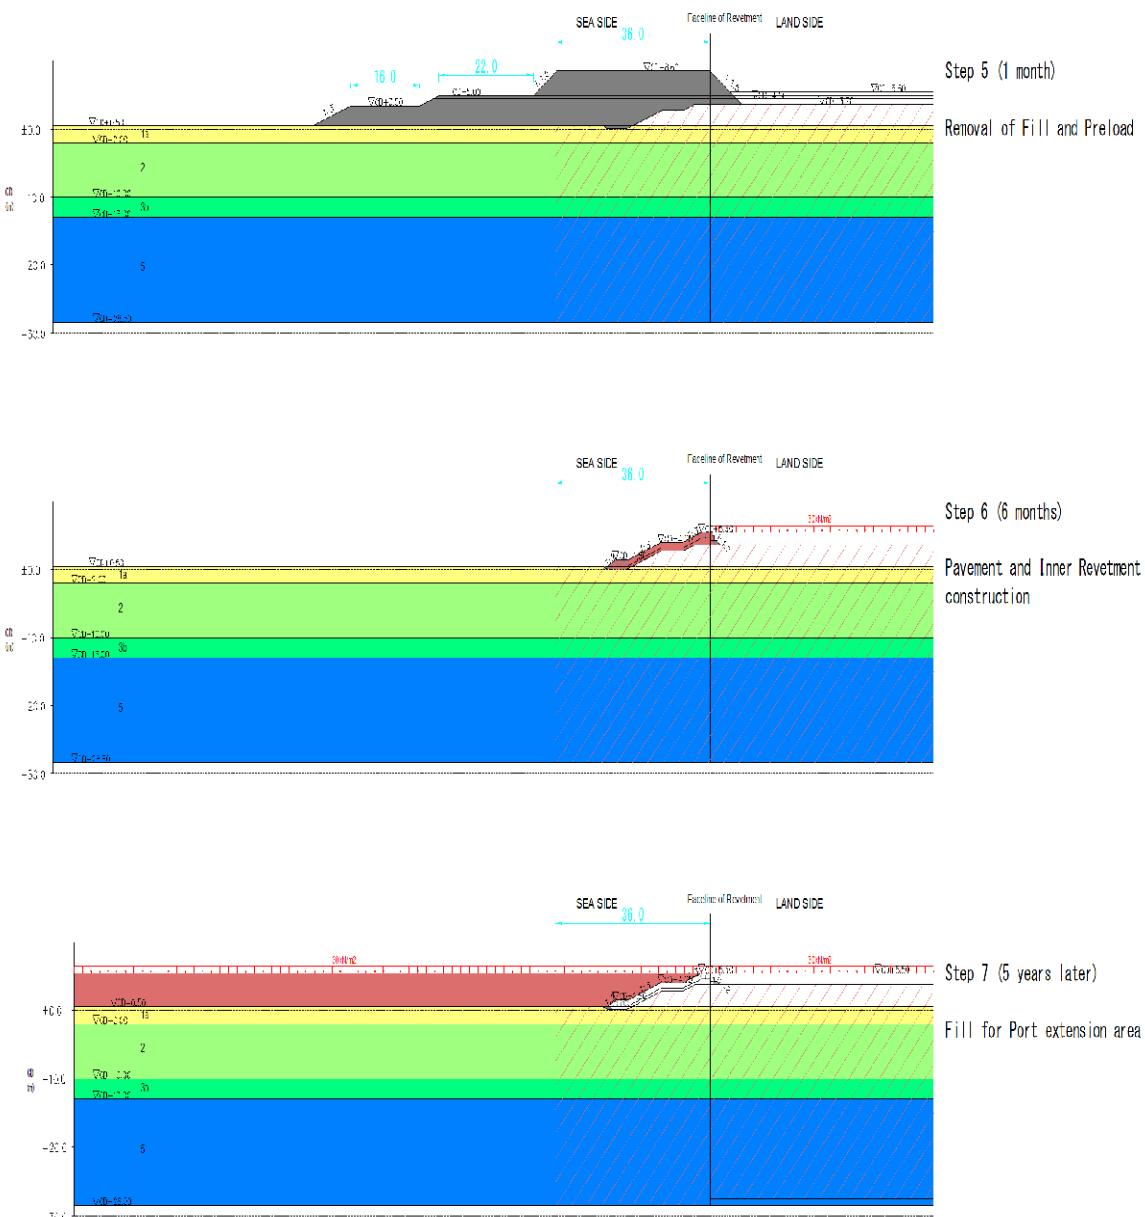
Subsoil Improvement Procedure with PVD+Preload at Section IR-1 (Inner Revetment) (2/2)
